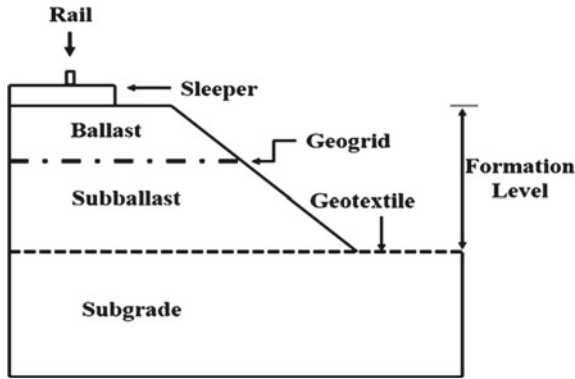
Cross section of a typical geosynthetic-reinforced railway track
